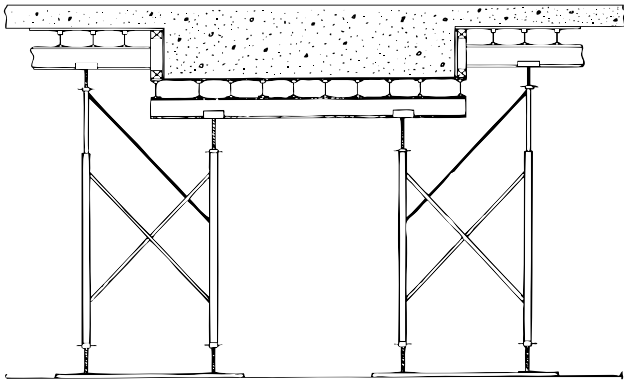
Typical concrete drophead shoring with Aluminum Shoring Joists.
